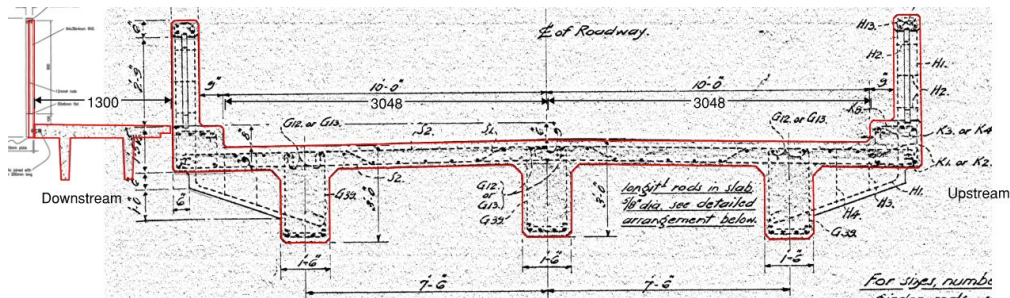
Cross section of Redclyffe bridge at pier mid-span (red lines denote outline)
